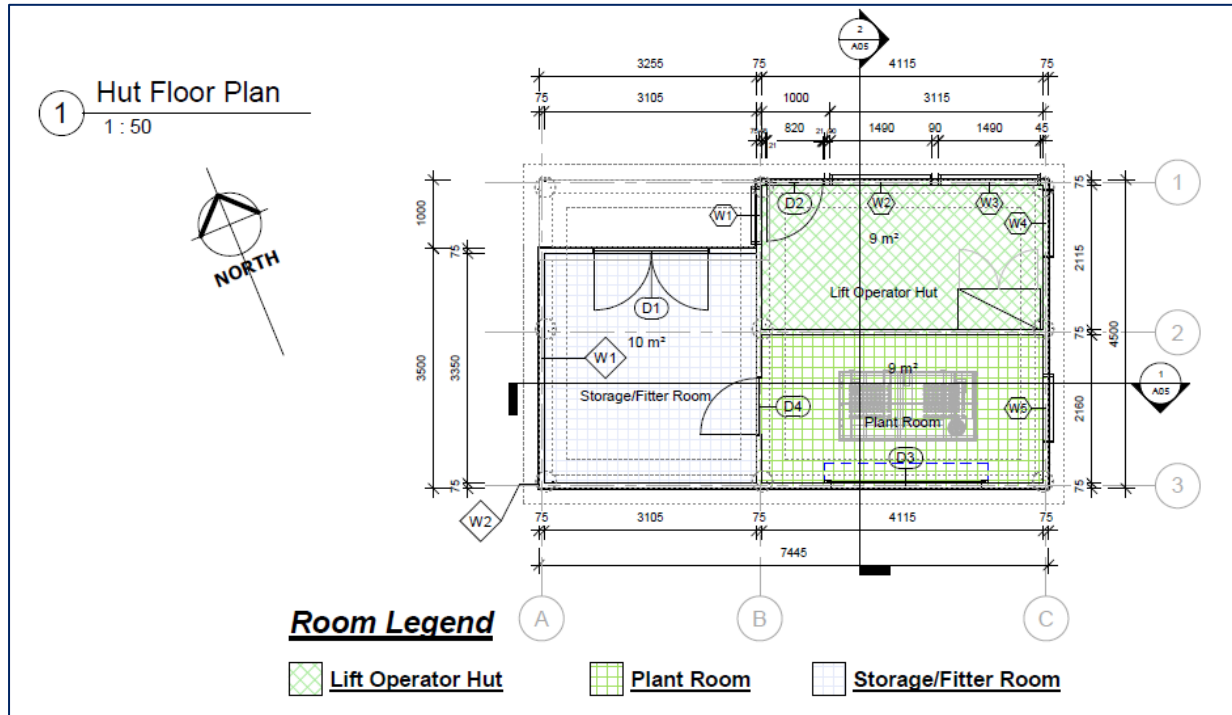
| Floor plan of proposed hut (Source: Applicant's documentation)
